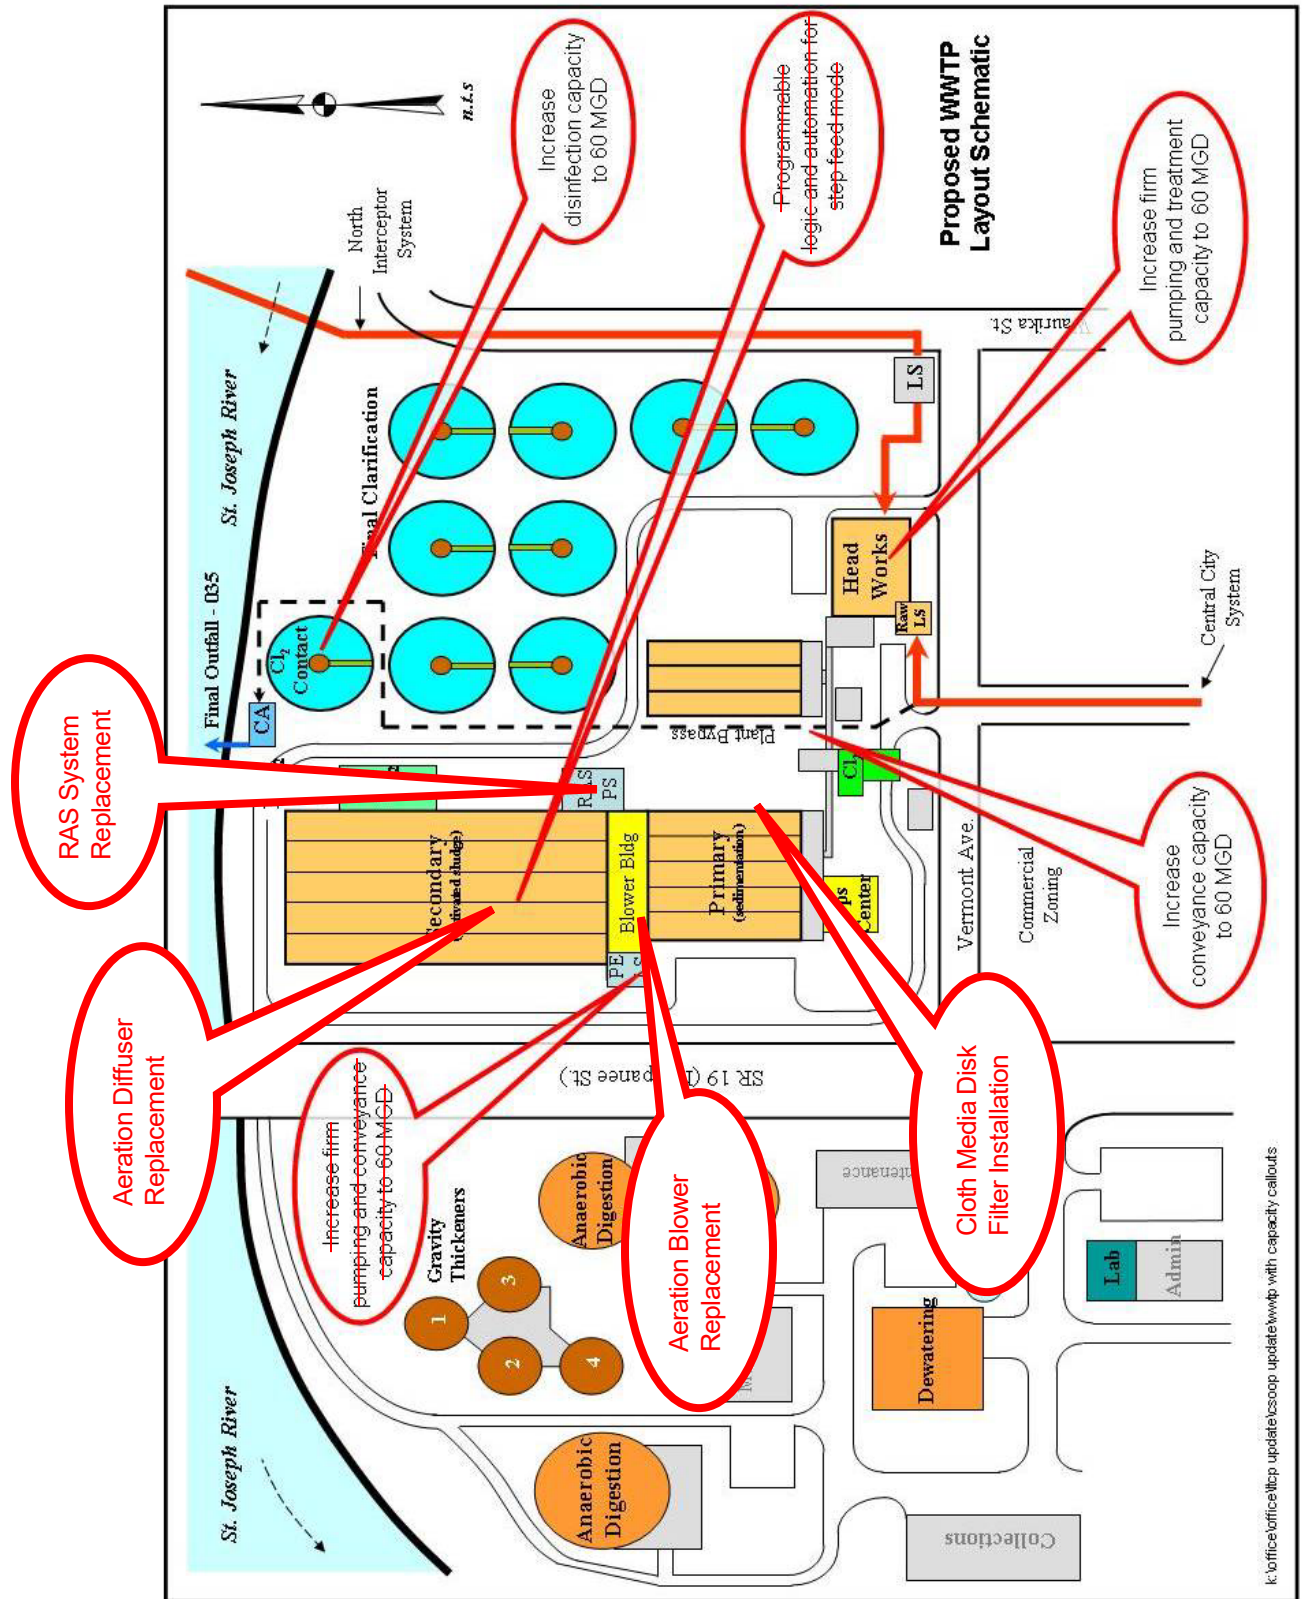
Schematic of Proposed Wastewater Treatment Plant Layout
